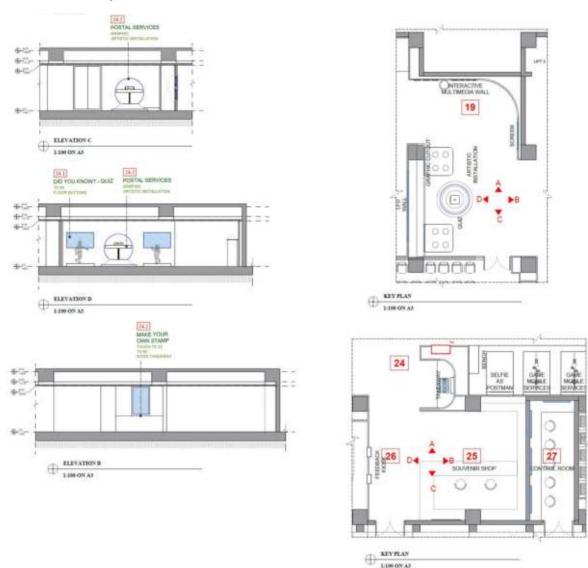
Proposed zone 24 Elevations. (Source-Author)
